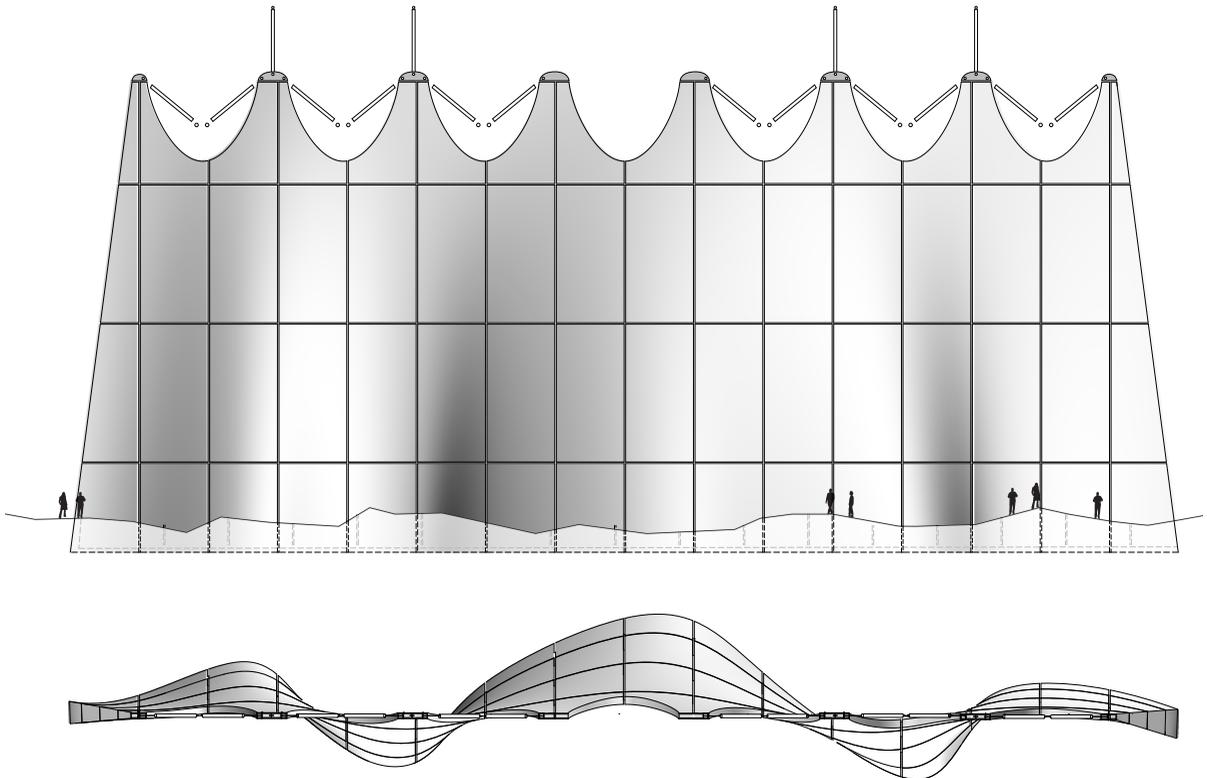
Plan and elevation of the Kofta mast. Scale 1:500
